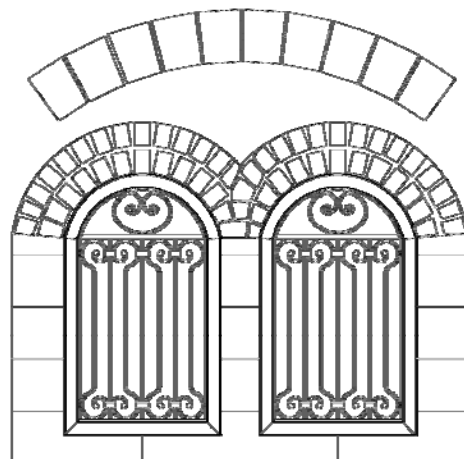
Twin windows overlooking al-Maḥgar Street
